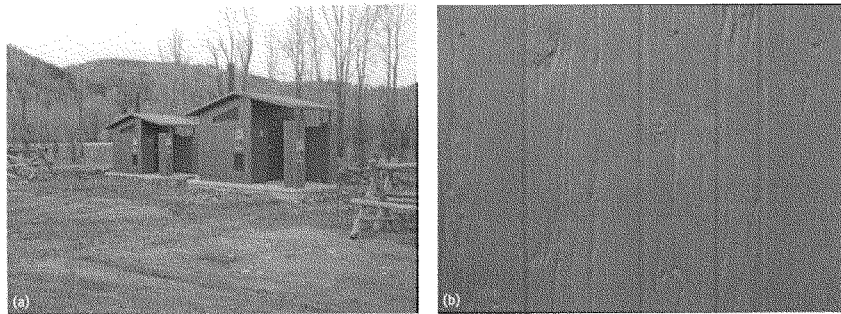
Completed vault toilets: (a) overall view of installation; and (b) detail of finished wall surface
